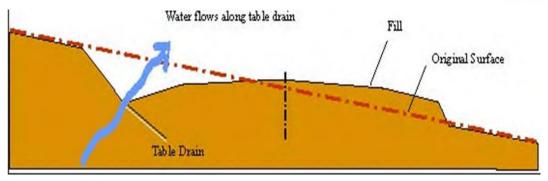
Access Track Infrastructure - Crowned Side Cut Formation Details
